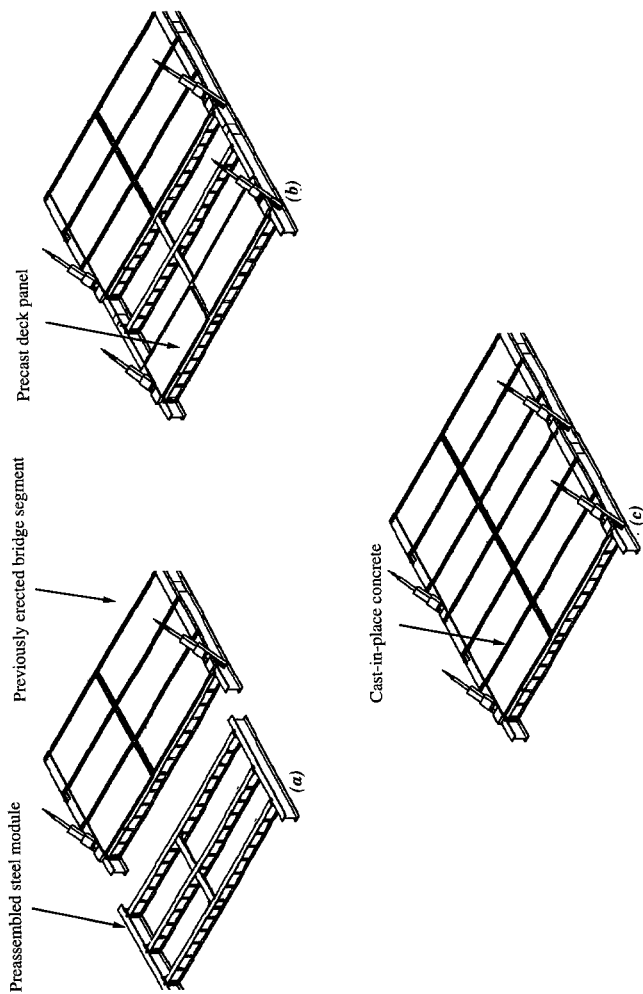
Bridge-Deck Construction Sequence: (a) Steel Lifted into Place; (b) Cables Hung and Partially Stressed, Precast Panels Set, Leveling Screws Adjusted; (c) Tensioning Bars Coupled to Previous Segment, Joints Poured, Slabs Posttensioned
